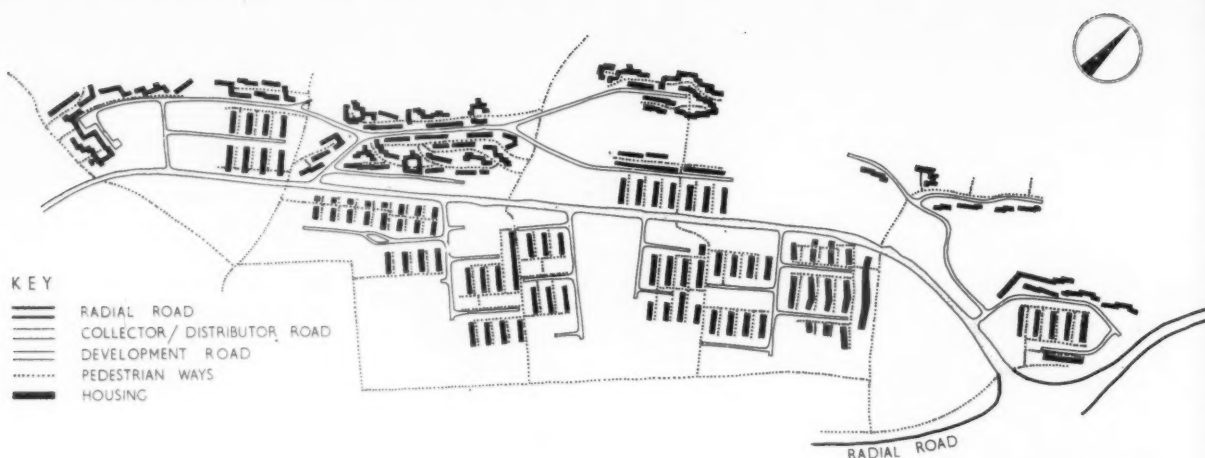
Housing layout on northern slopes, showing separate road and footpath systems. Scale 1/10,000.
